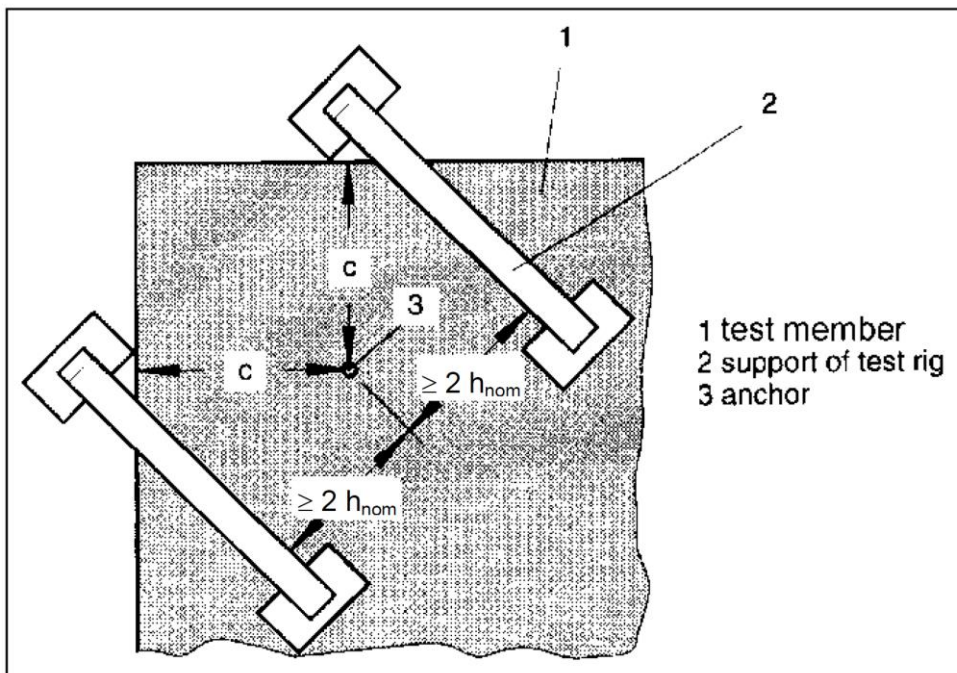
Example of the test rig for tension tests on plastic anchors at a corner
